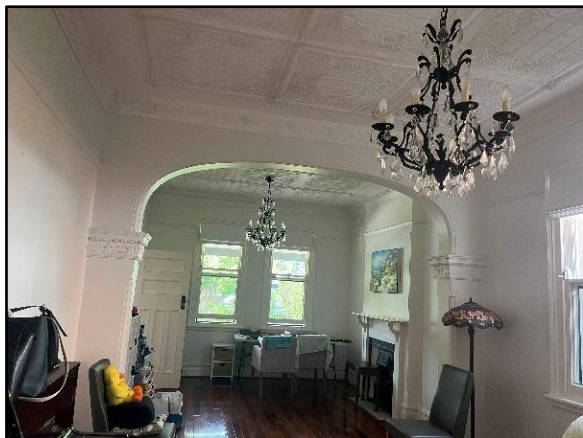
Internal view of original ornate fibre plaster ceilings and front rooms at 24 Middle Harbour Road.
